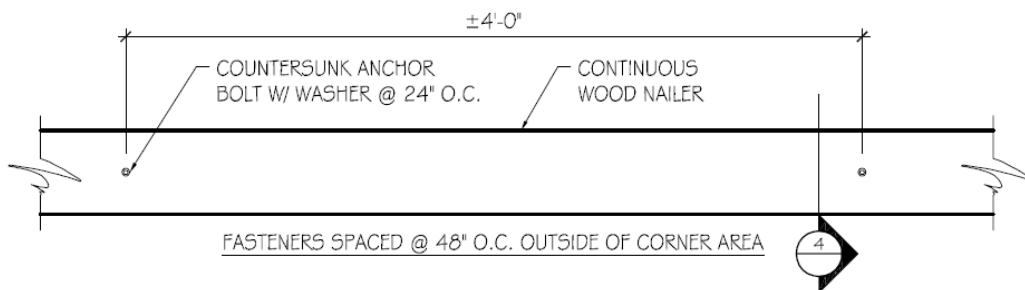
B - TYPICAL ROOF EDGE WOOD BLOCKING - THROUGH BOLT ANCHORAGE
